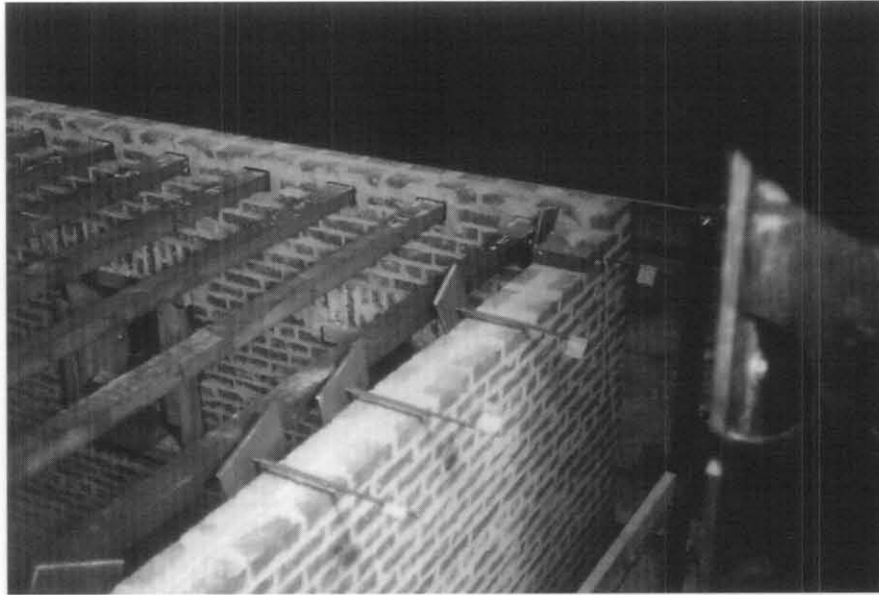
Out-of-plane Wall Connection Before Laying the Masonry
